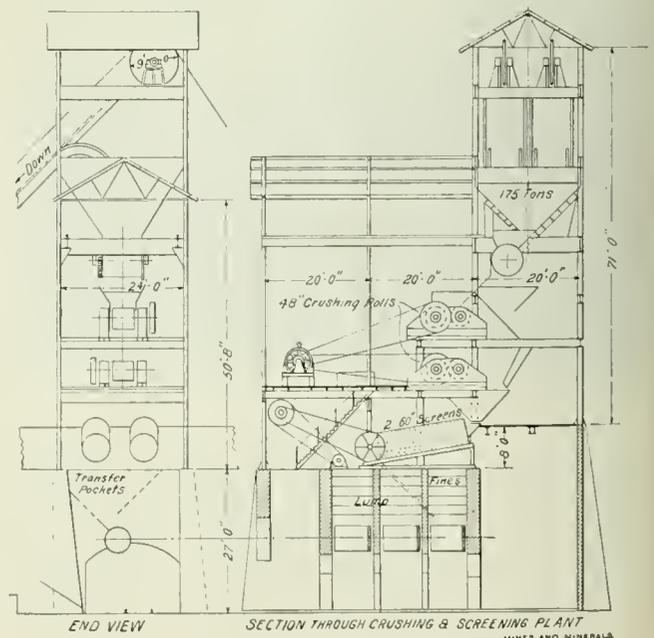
END VIEW AND SECTION, ORE PREPARING PLANT
